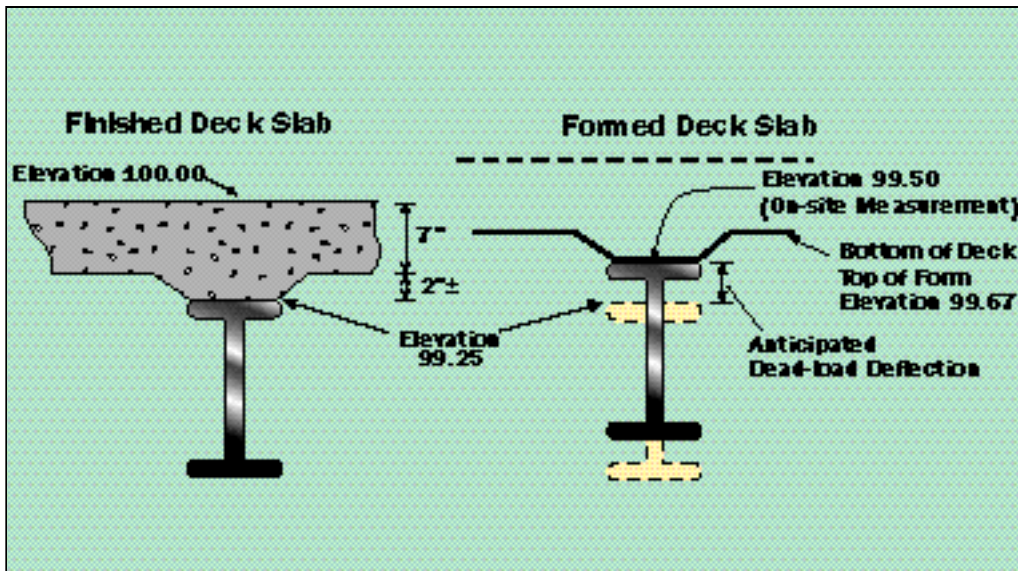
Engineers mark the elevation of the as-built girders at 8 to 10 equally spaced points along the beam. These elevations vary due to beam fabrication and placement tolerances. Using the girder elevations and information from the plans, workers can set the top of the forms to account for dead-load deflection. If the beam elevations vary, a constant slab thickness is maintained by adjusting the height of concrete above the girder.
